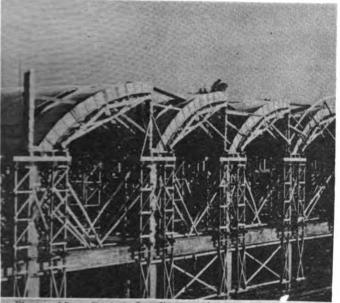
Bldg. I - View looking north. Construction was completed in 1939. It is of concrete frame curtain walls. It has the curved type skylight.
